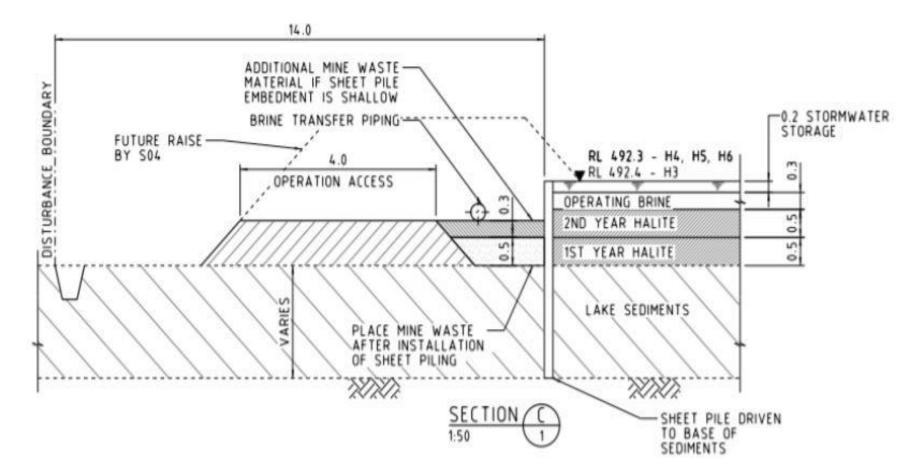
Typical plastic sheet pile methodology wall design (Halite pond example)
